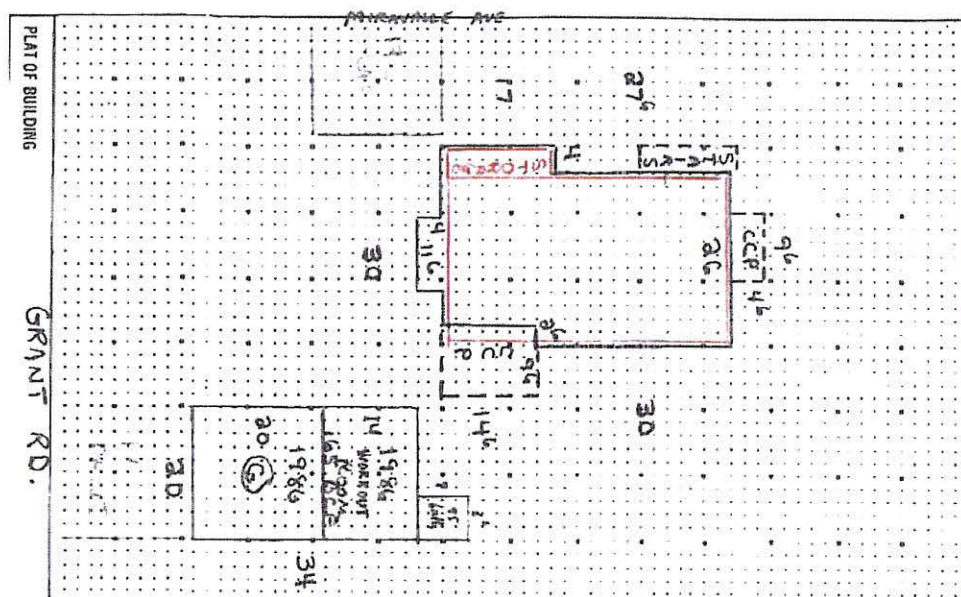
Santa Clara County Residential Unit Property Record for 1365 Grant Road, Plat of Building.
